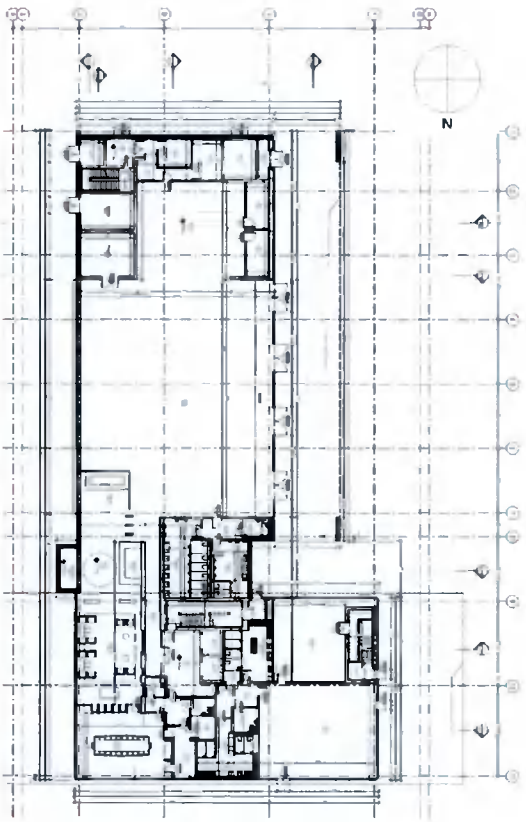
C.A.B. Proposed Ground Floor Plan (Level 01) (image updated)
